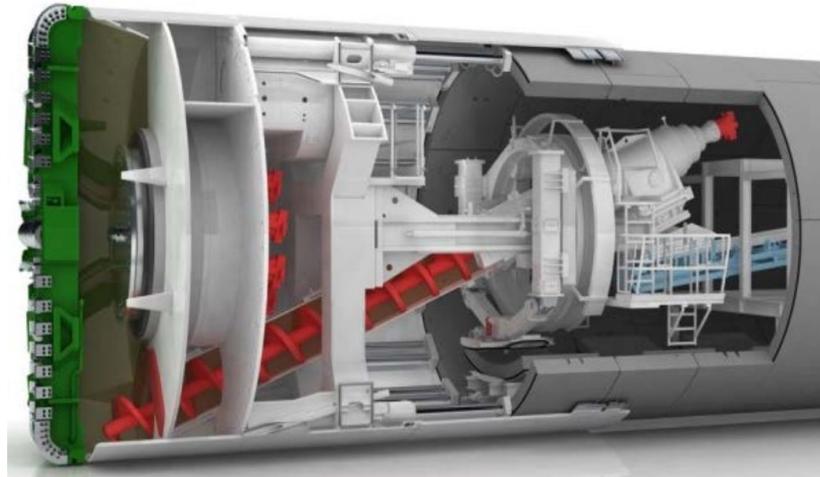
EPB TBM Machine Mechanism (Burger and Herrenknecht AG, 2016)
